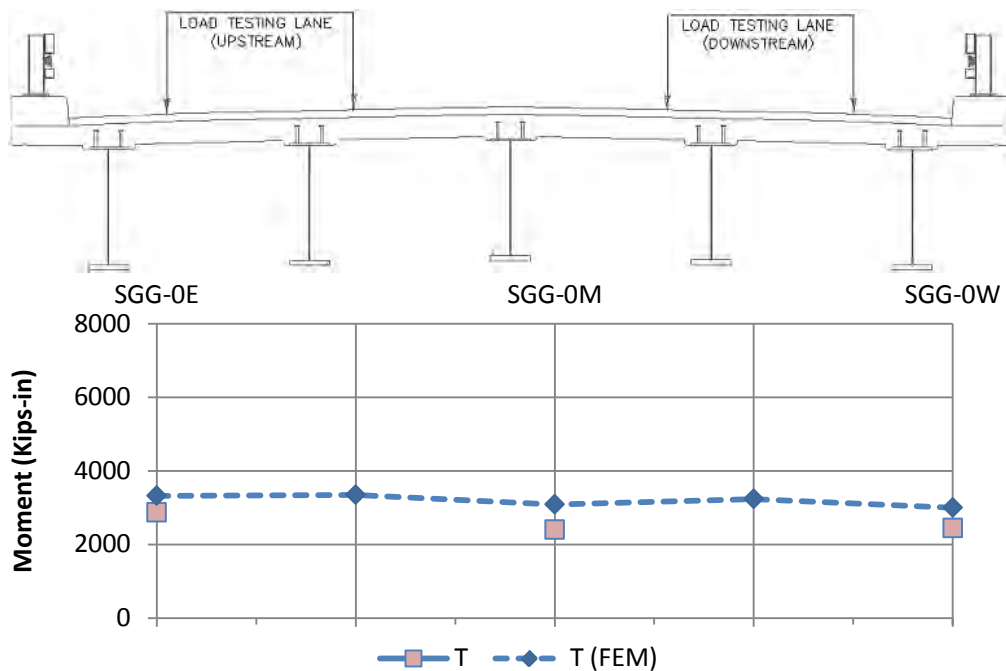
Girder Moments at the Bridge Midspan (Trucks at Both Lanes)
